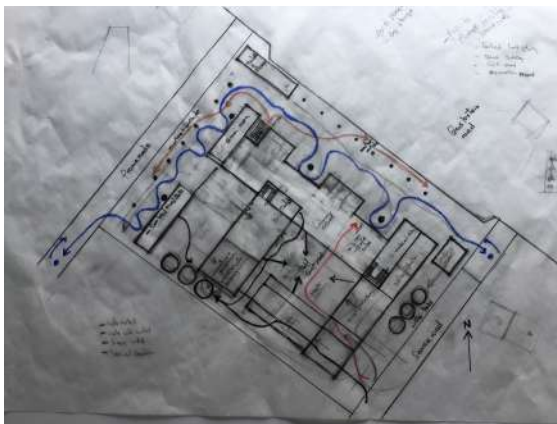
Ground floor plan exploration (Author,2020)
